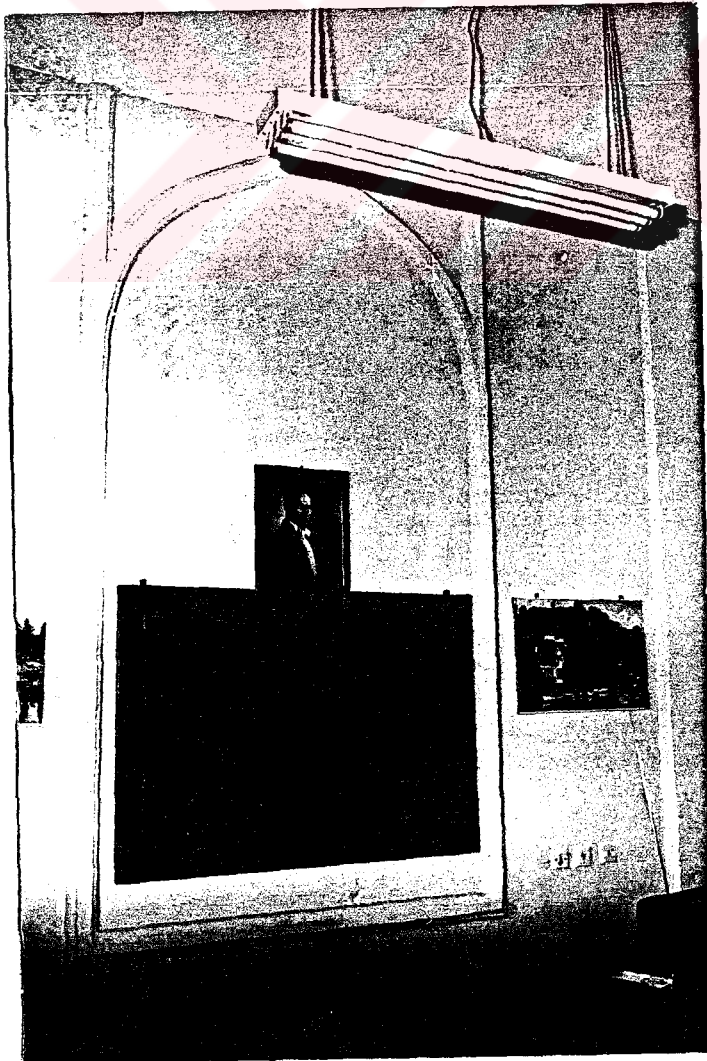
SE wing - upper floor - SE wall of the room on the NE (1987)
